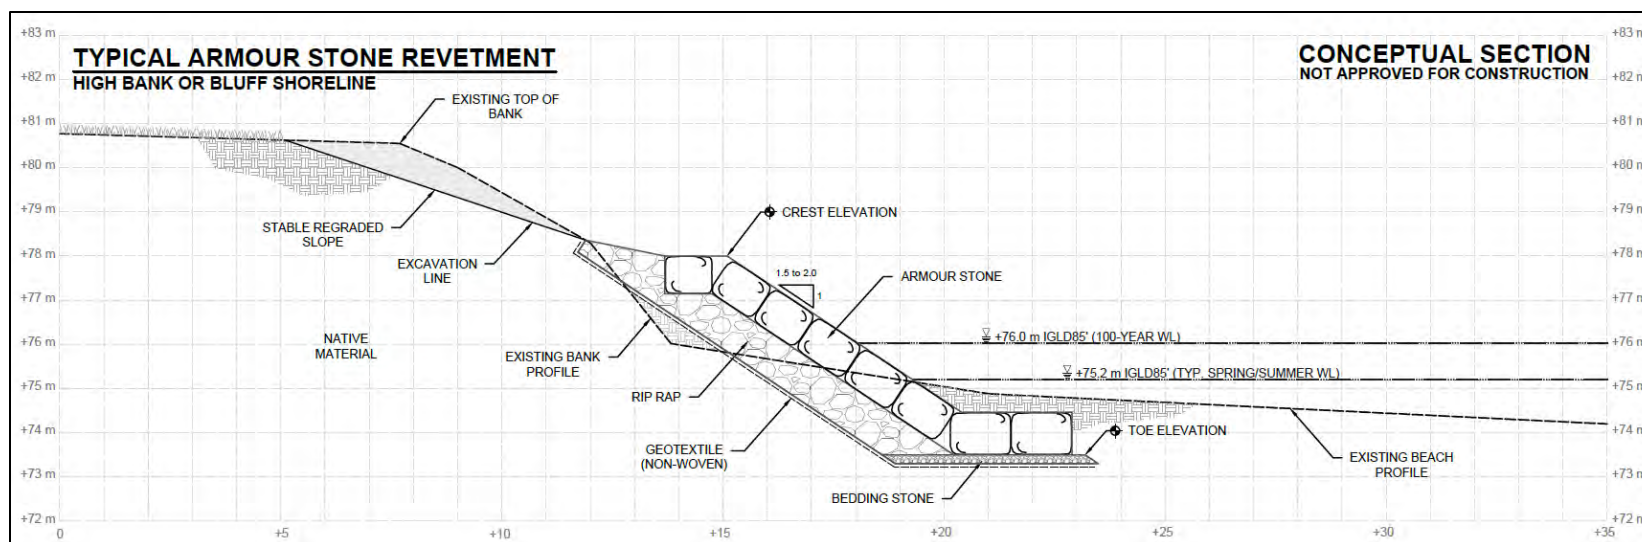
Recommended Typical Armour Stone Revetment Concept for a Medium to High Bluff (3 to 10 m)
